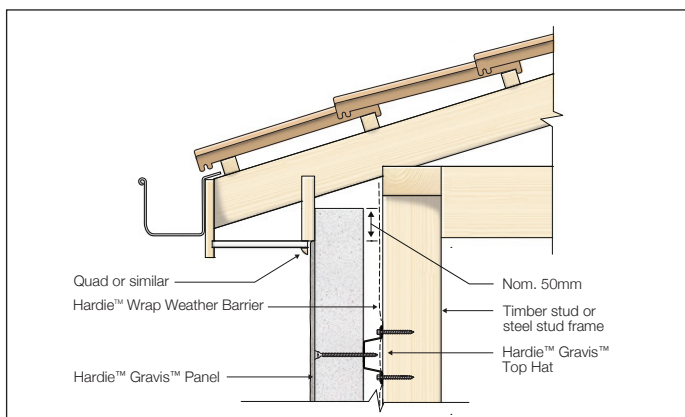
EAVE DETAIL - PANELS FINISHING ABOVE SOFFIT
